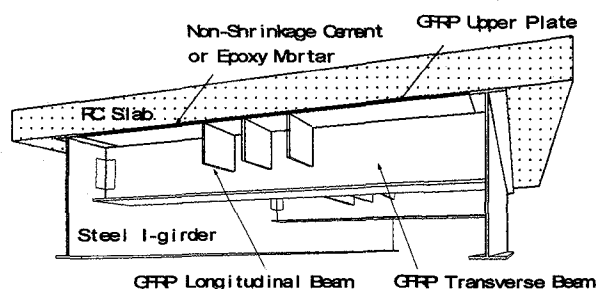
Illustration of Steel I-girder Bridge Retrofitted by GFRP Members.
